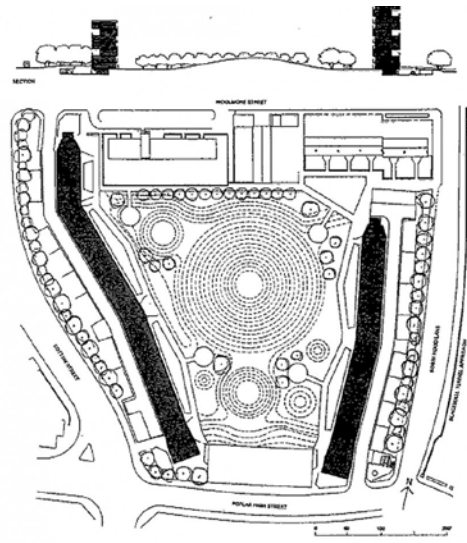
Master plan, Robin hood Gardens [source: ArchDaily]
